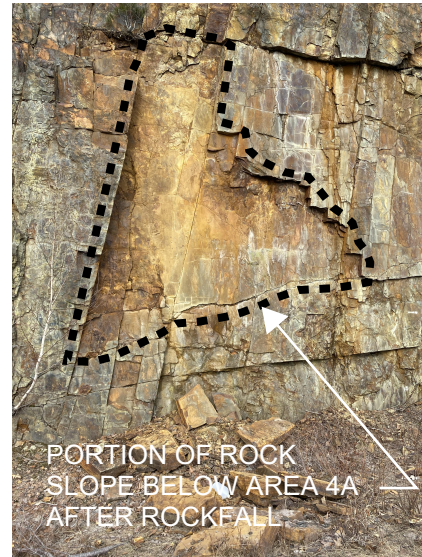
(ABOVE): ROCK SLOPE BELOW AREA 4A AS IT EXISTED ON 18 MARCH 2022.
